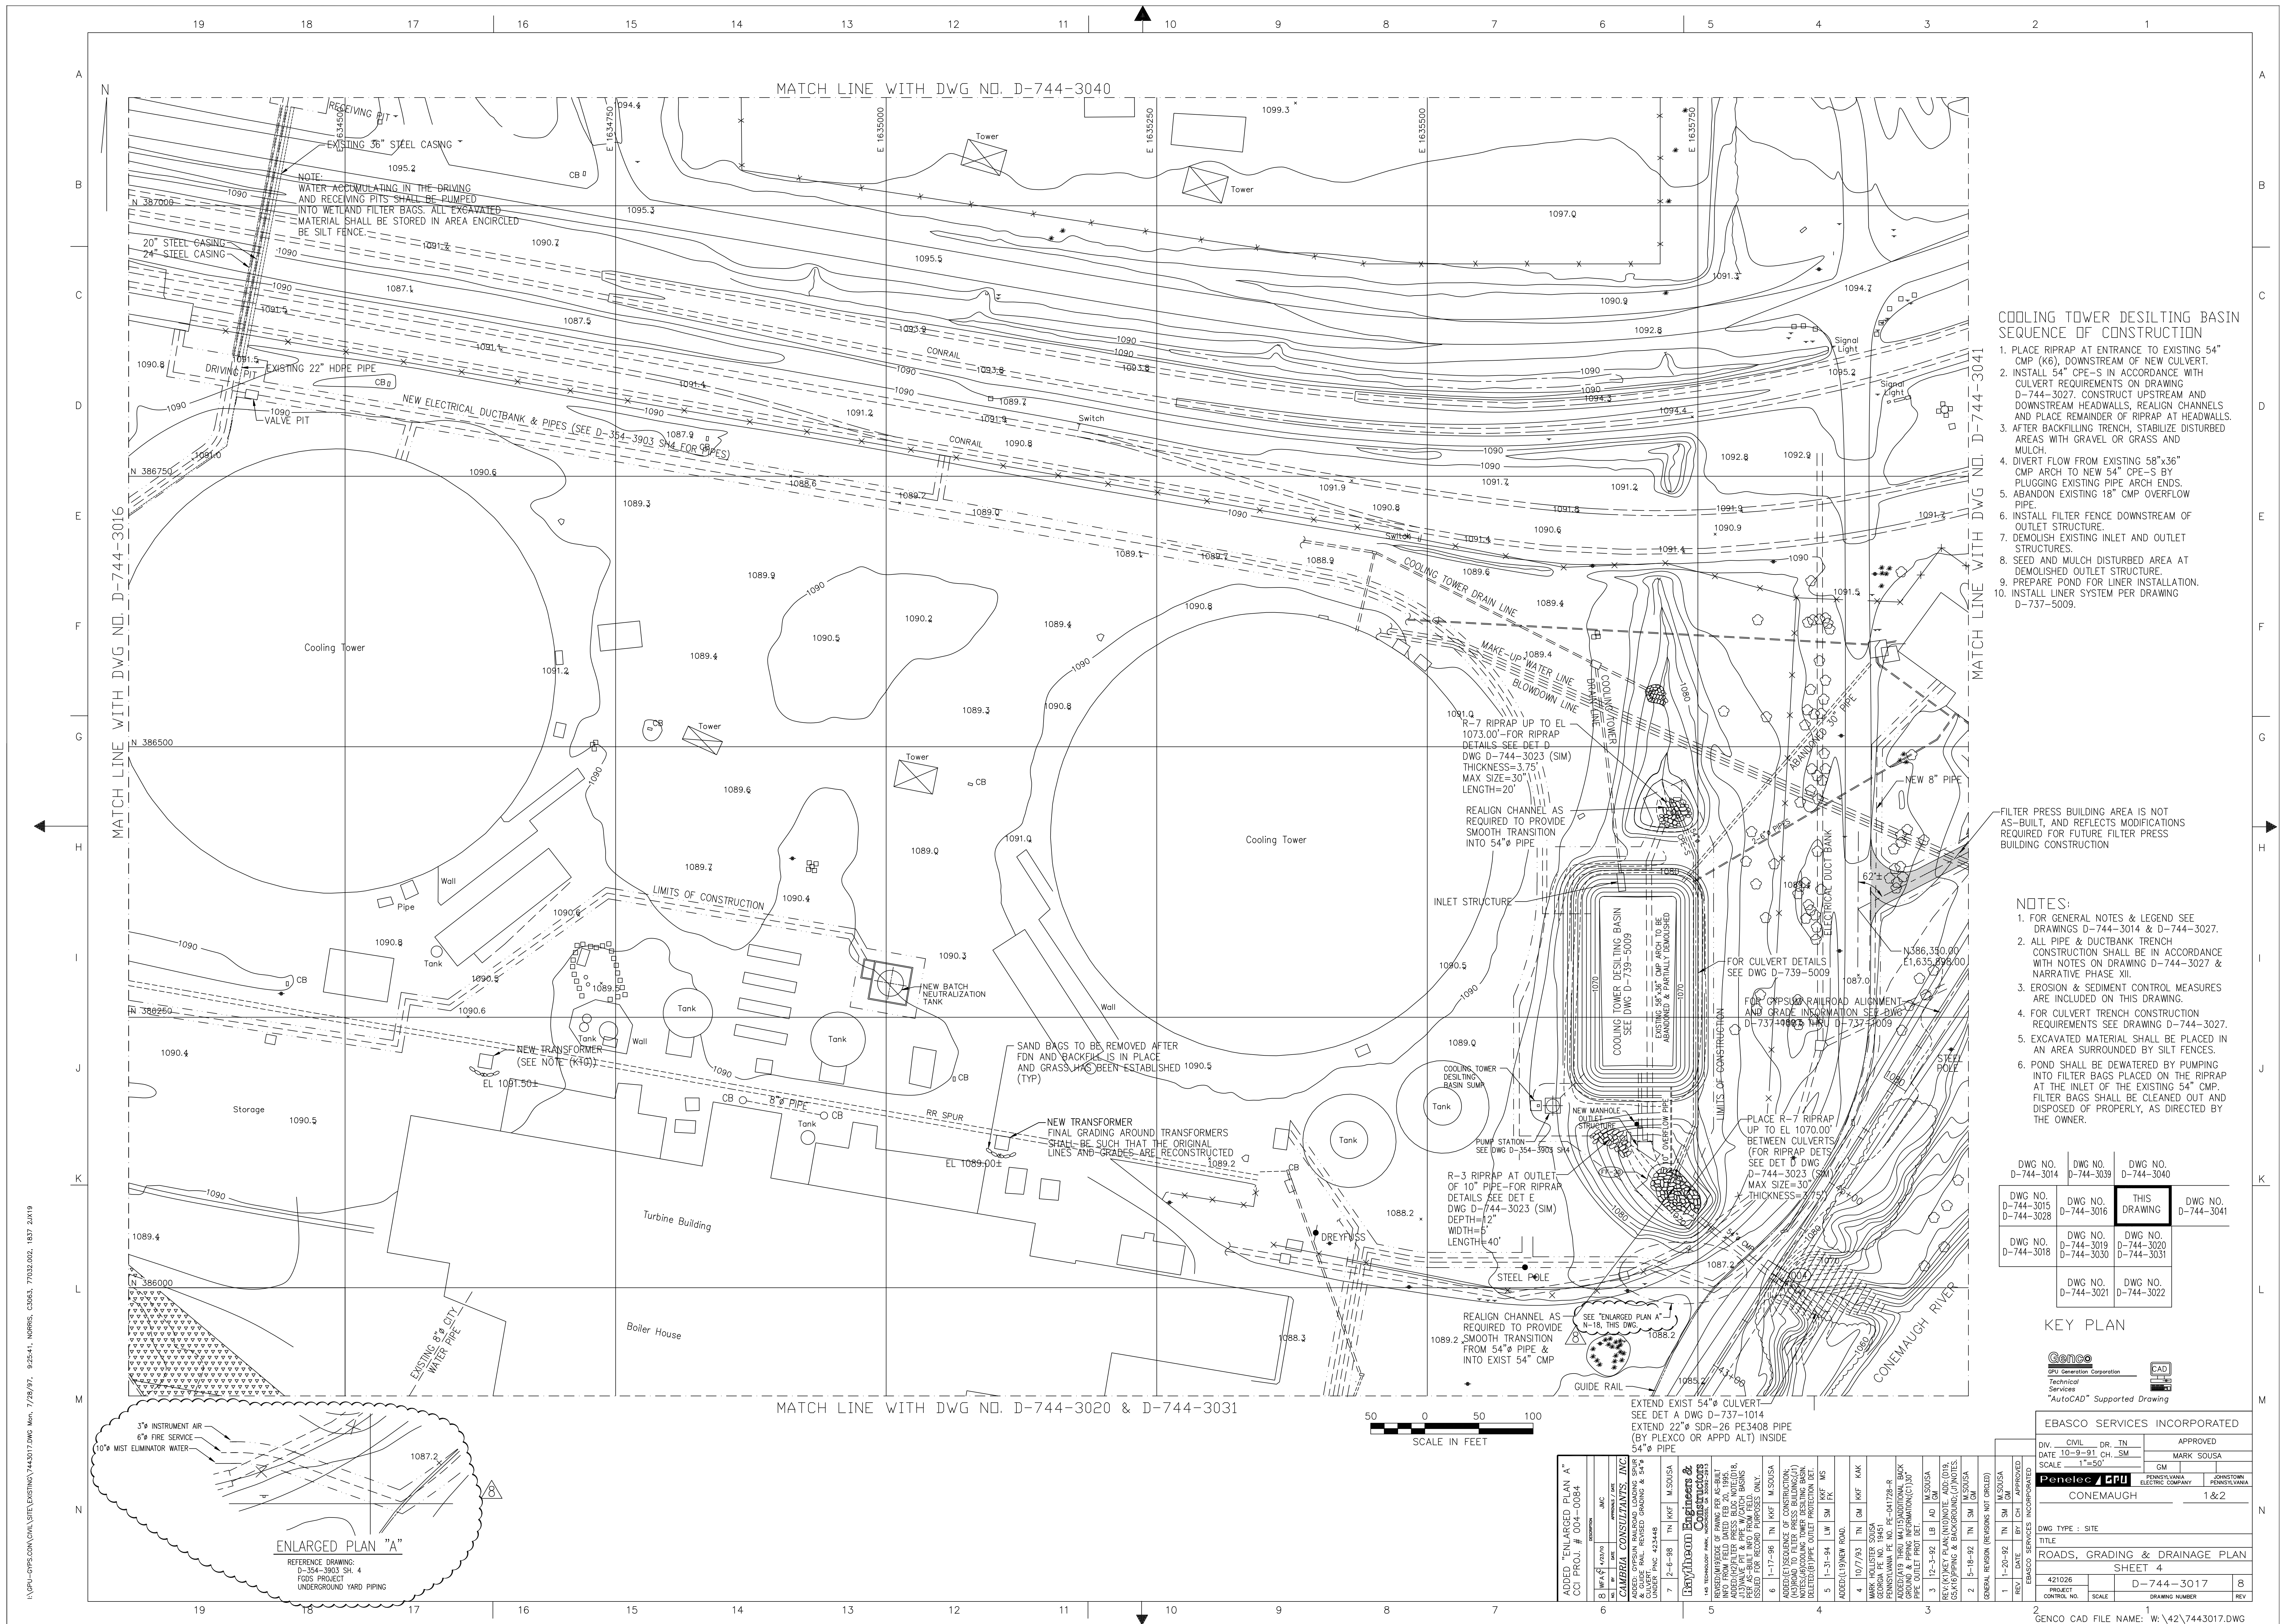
(Cooling Tower Desilting Basin)
